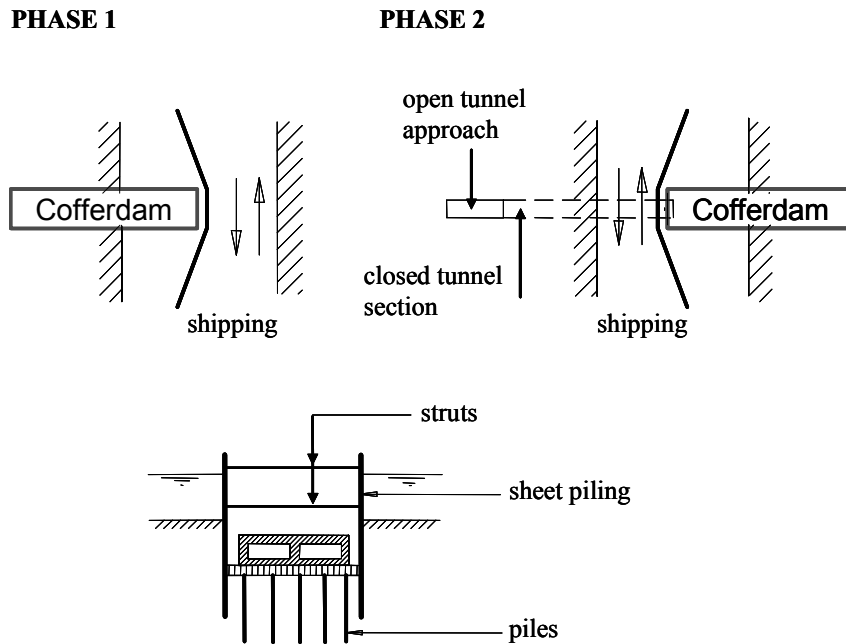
Cofferdam constructed in-situ for a tunnel
